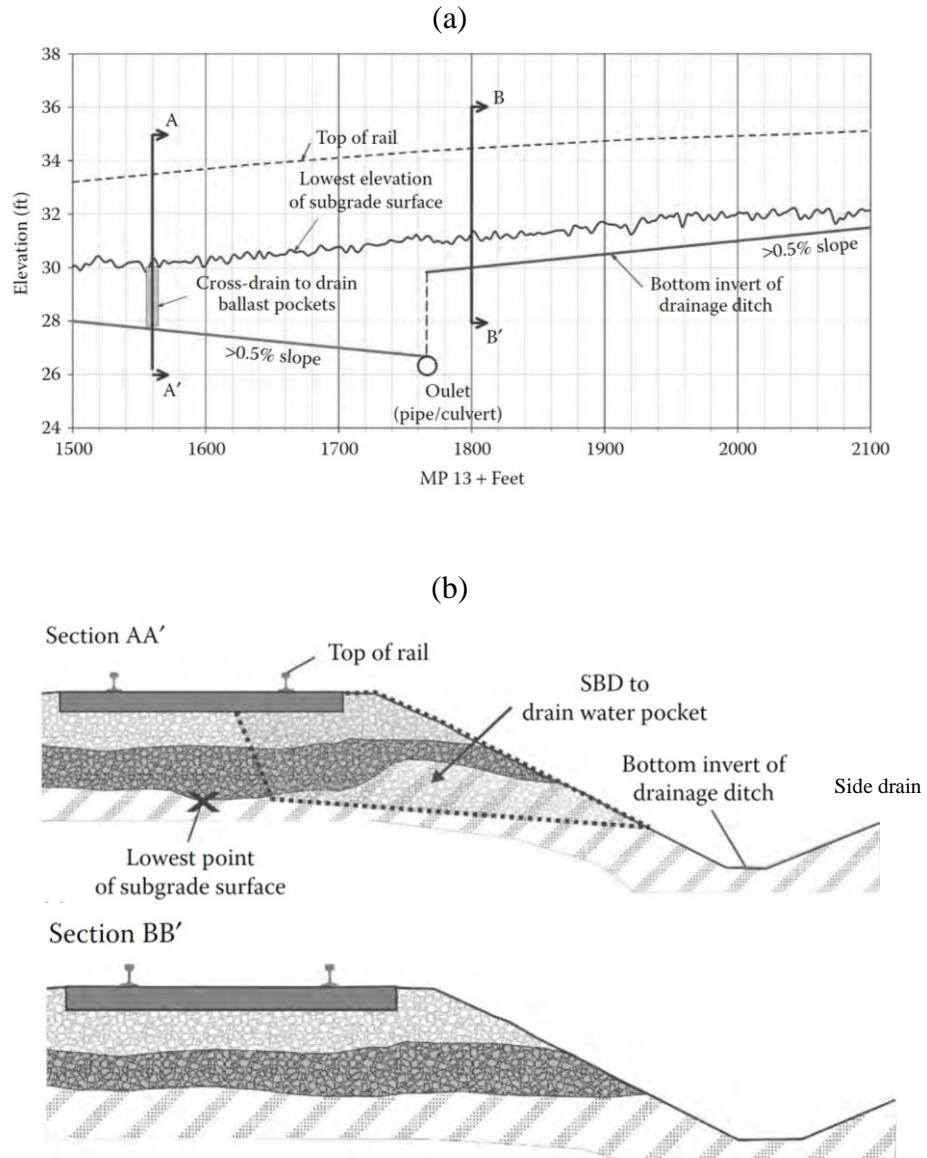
Example of surface drainage system design (a) plan (b) cross-sectional view (Li et al. 2016)
